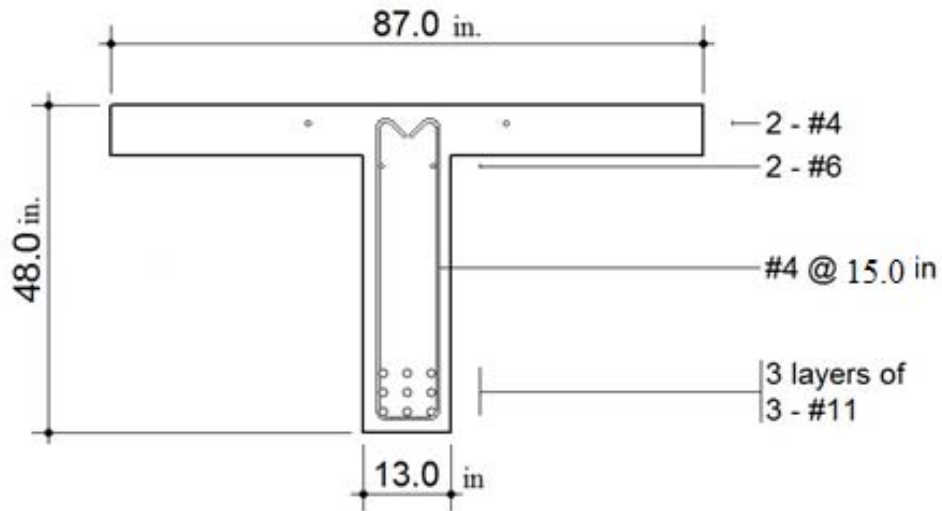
Cross-section of example girder 3.0 m (10 ft.) away from support
